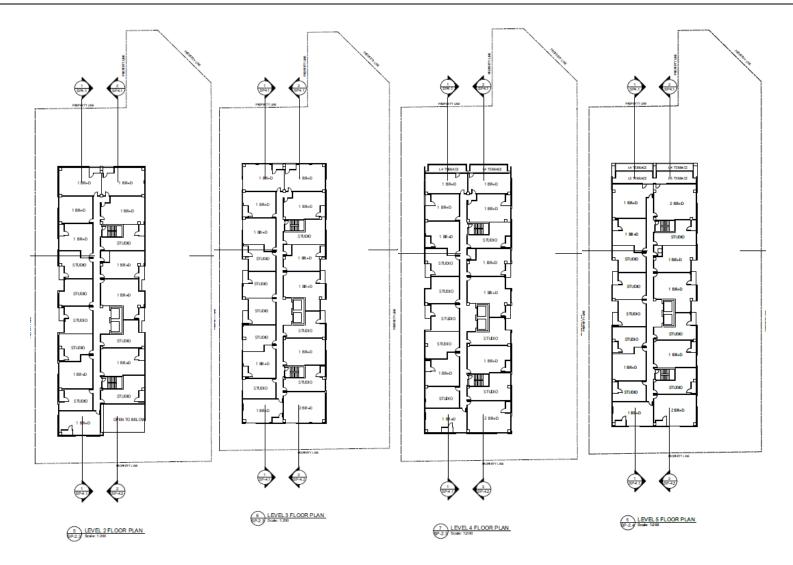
2023 Proposed Development at 6179 Lundy's Lane - Floorplans of Floors Two Through Five (MB1 Urban Planning 2023b)
